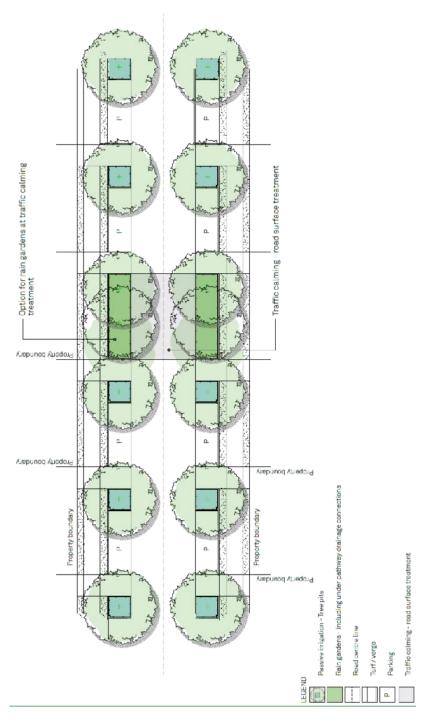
Typical Local Area Traffic Management Facility on a local street
